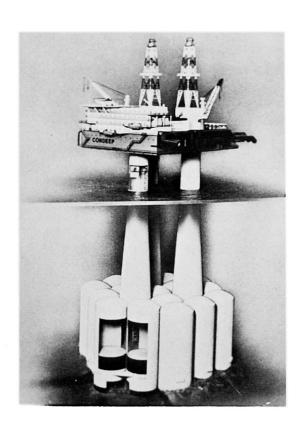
Condeep, Norway's multicell precast concrete oil production facility.
